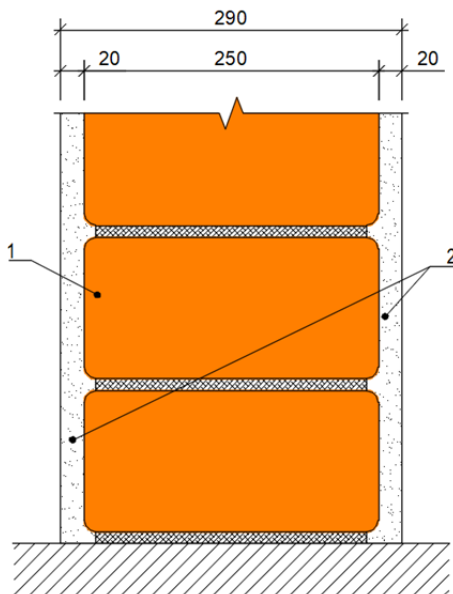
Detail of masonry brick (1) wall with gypsum plaster (2).
